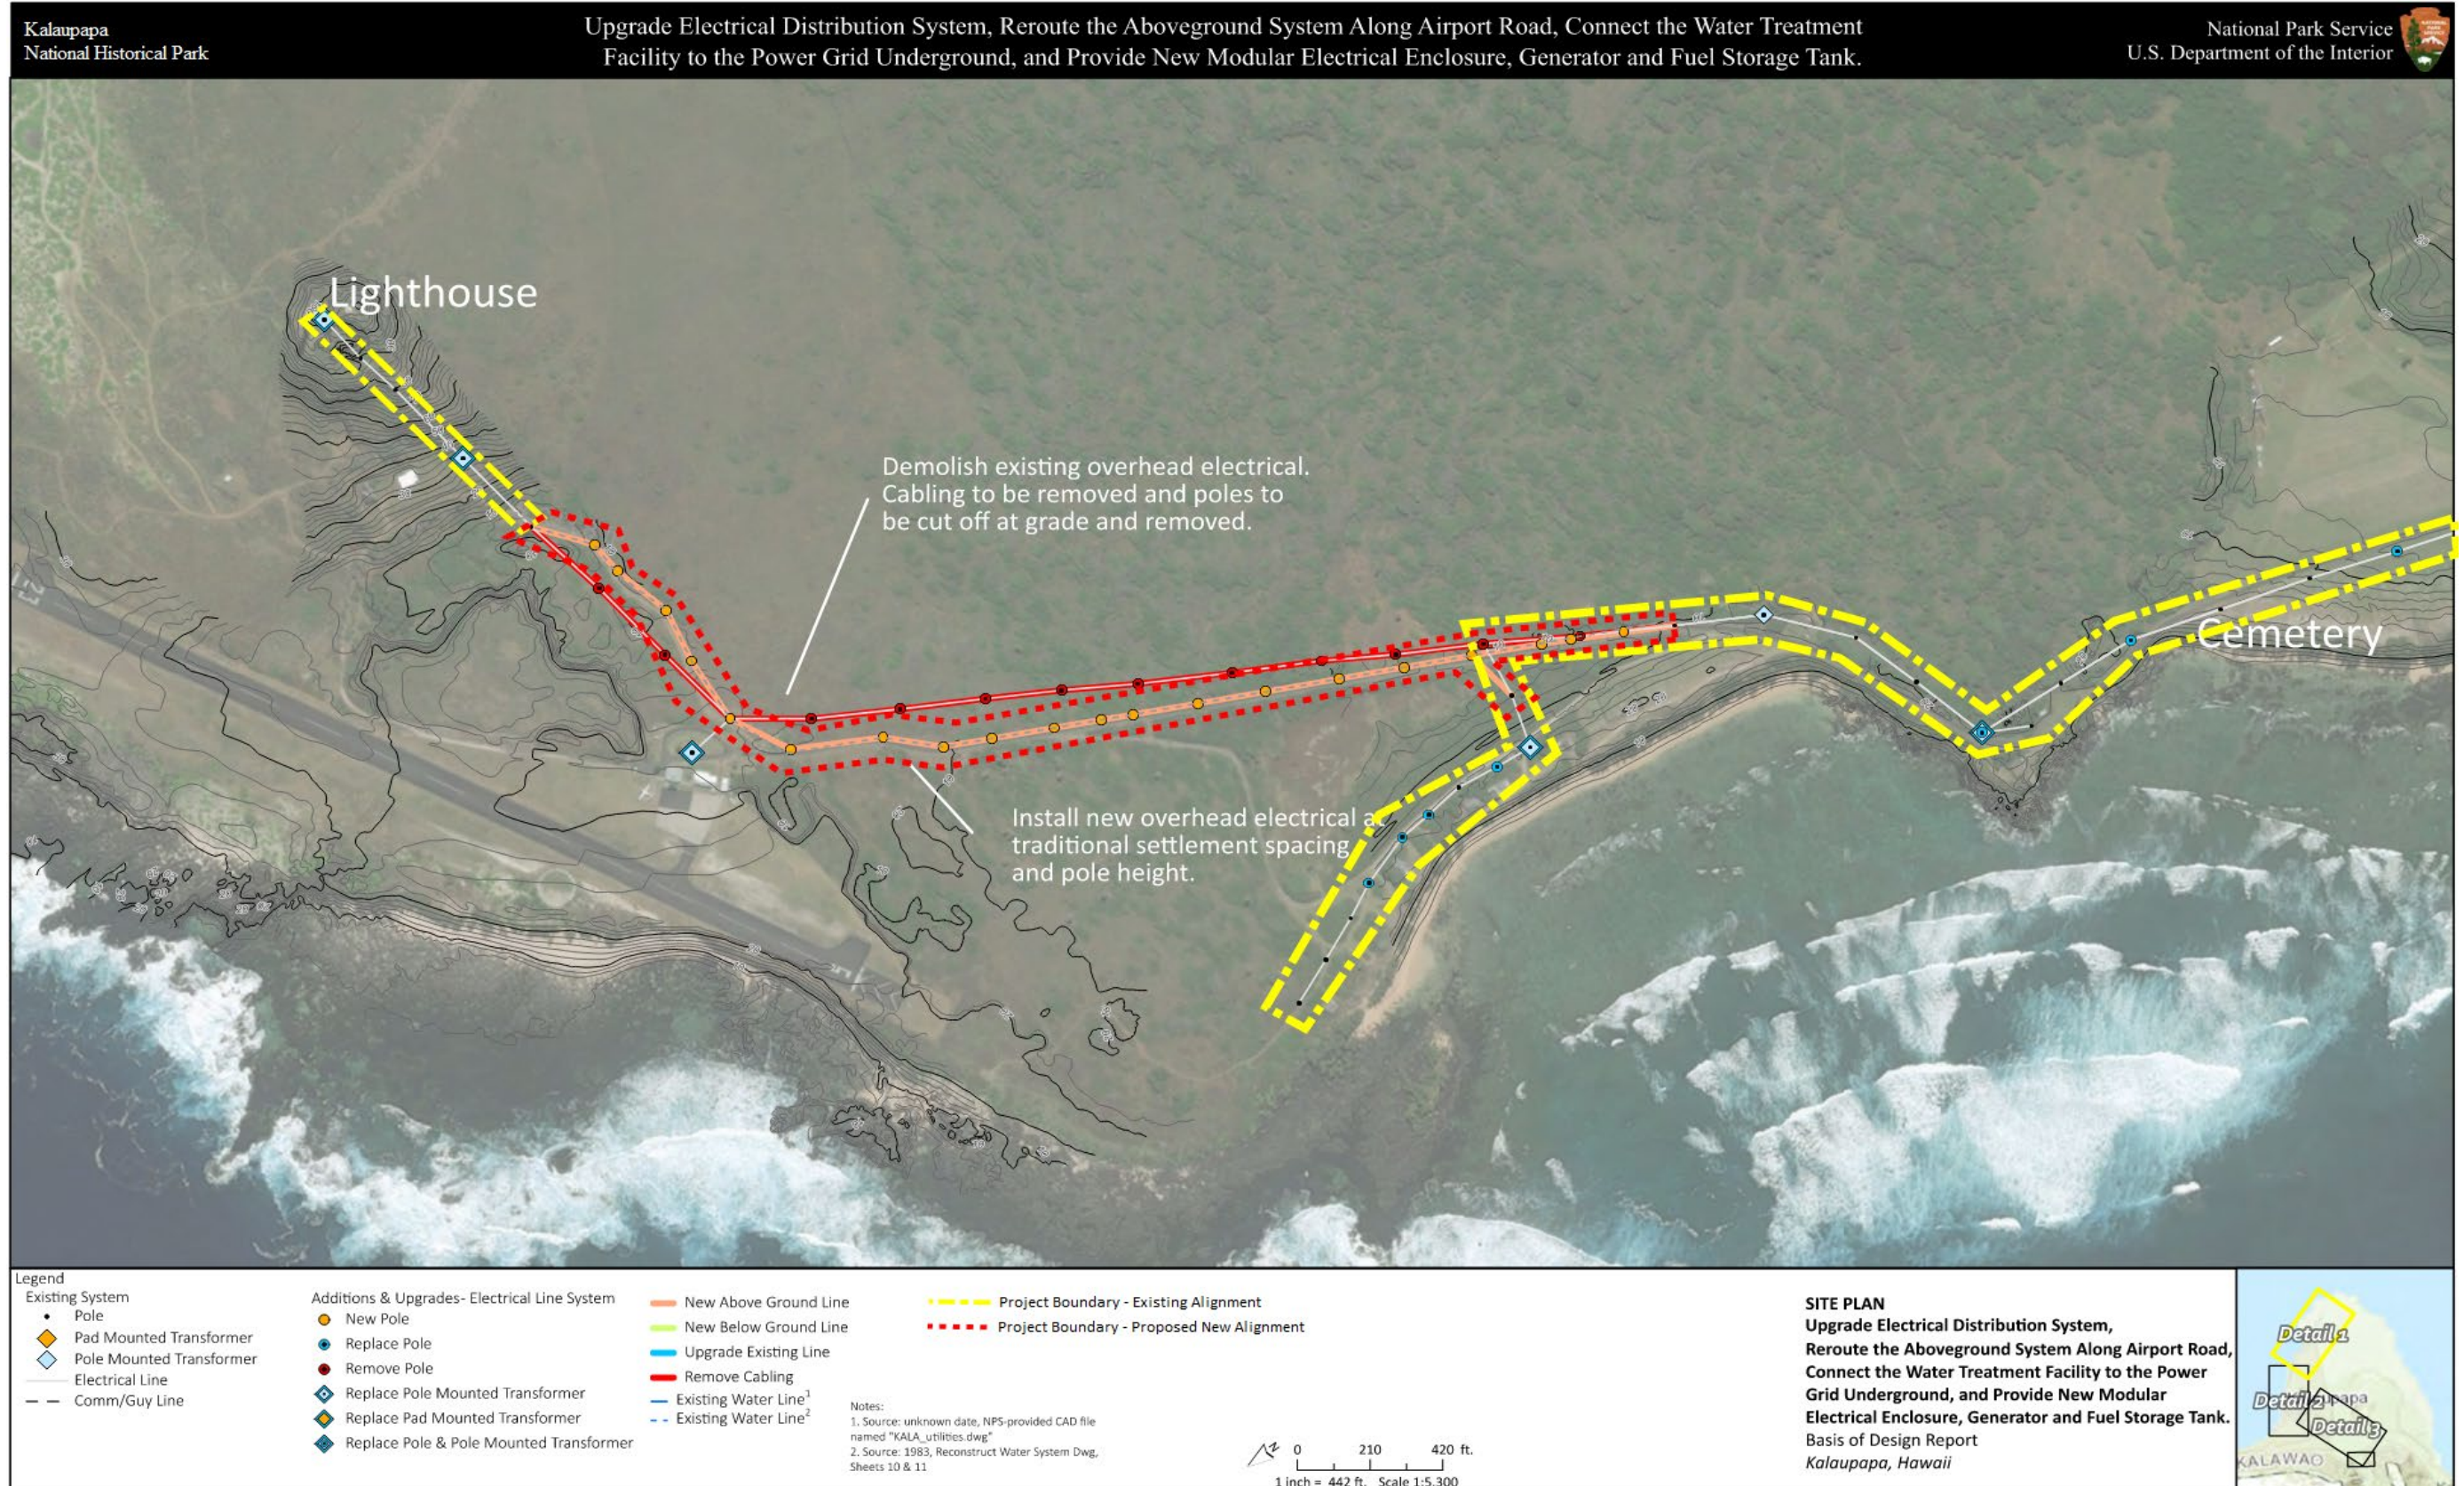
ALTERNATIVE 2 ALIGNMENT FROM LIGHTHOUSE TO CEMETERY
